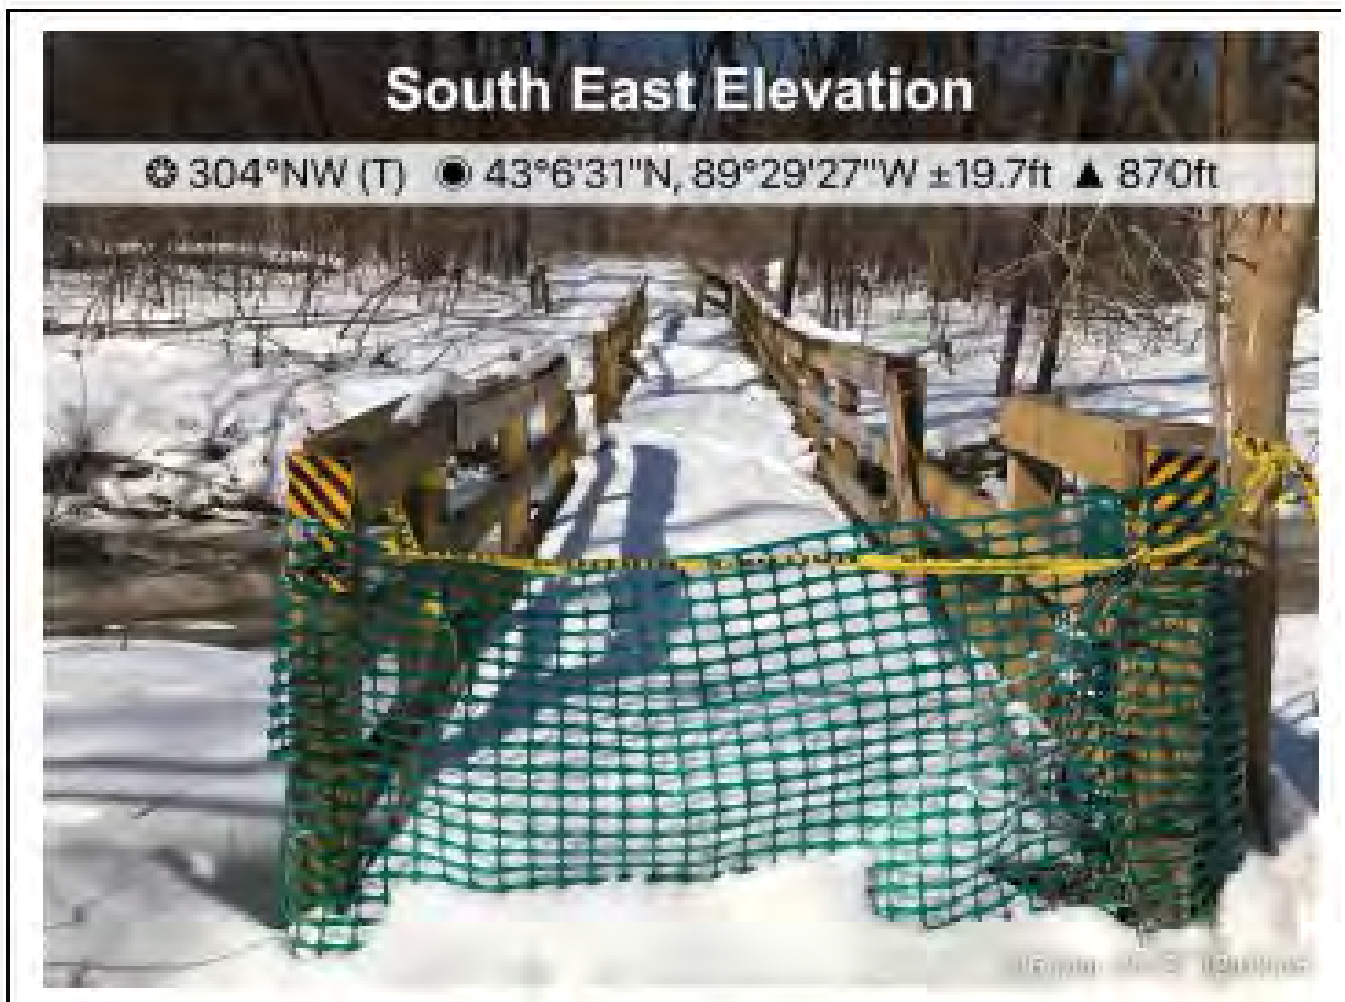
Site 28 (March 2019) taken at 43.10864, -89.49090. View of damaged pedestrian bridge and trail. Bridge repairs are not eligible for FEMA funding. Trail will be resurfaced to pre-disaster condition.
